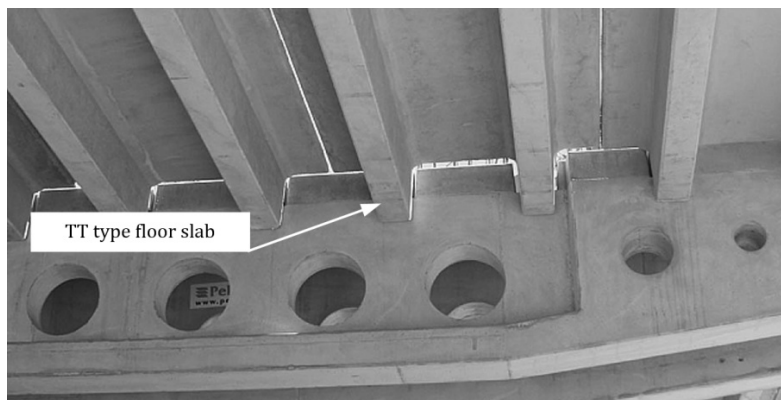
View of the industrial ceiling with TT type pre-stressed concrete slab [2]
